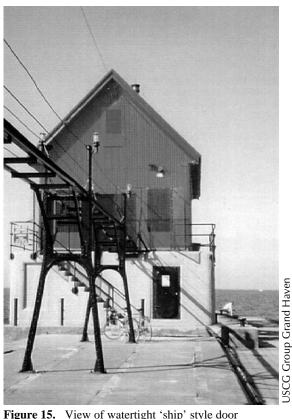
View of watertight 'ship' style door installation on the Grand Haven South Pierhead Front Range Light, Grand Haven, Michigan.
